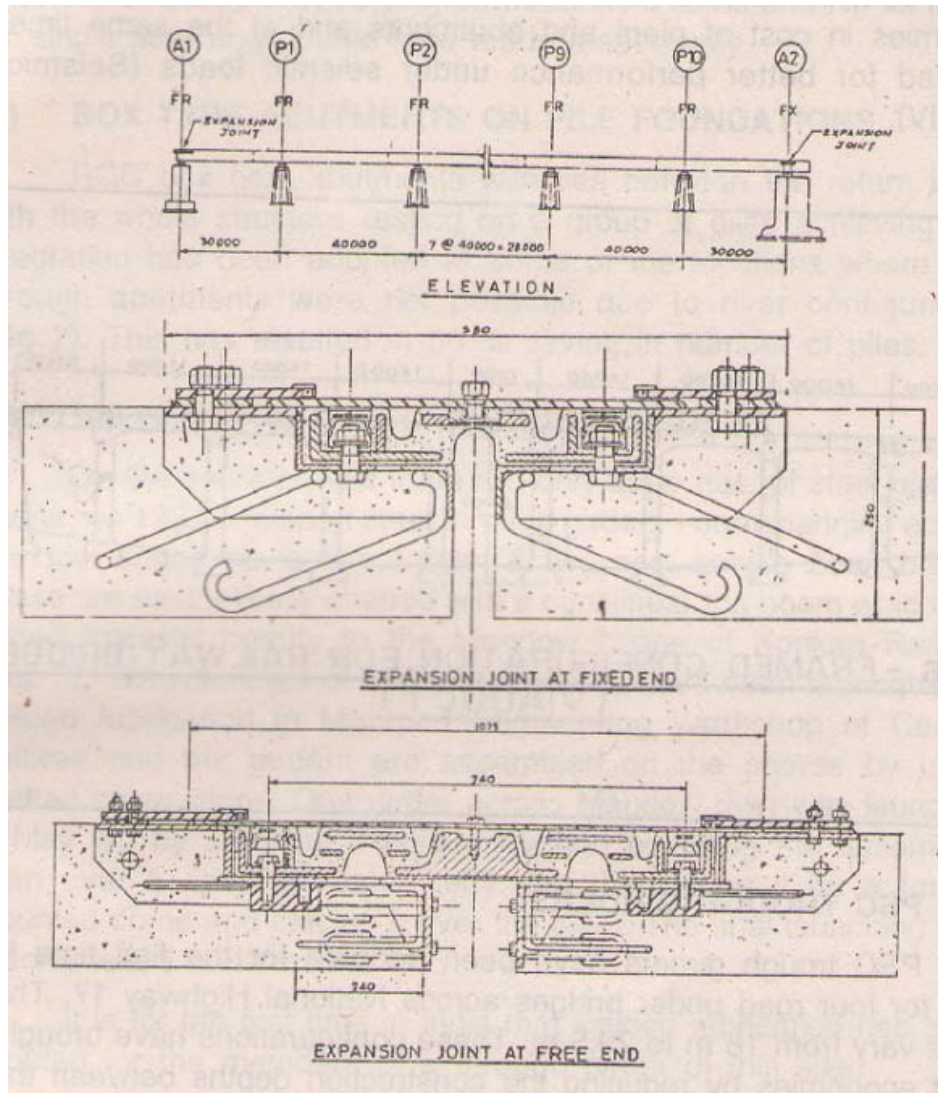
Special Expansion Joint At Panval Nadi Viaduct
